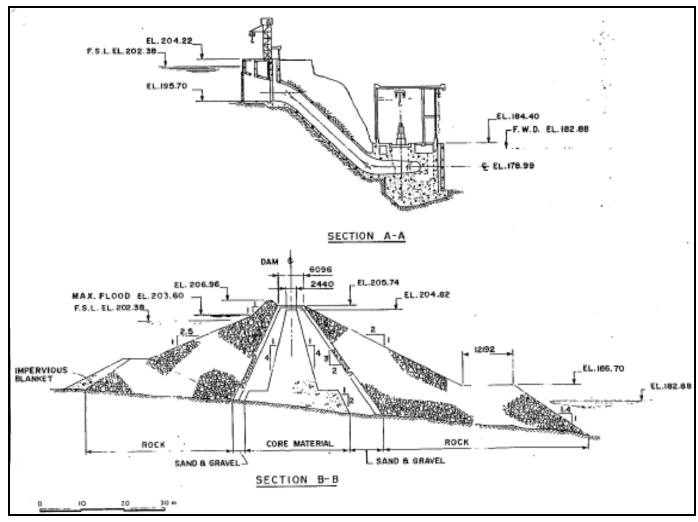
Snare Falls G.S. – Layout and Typical Sections
